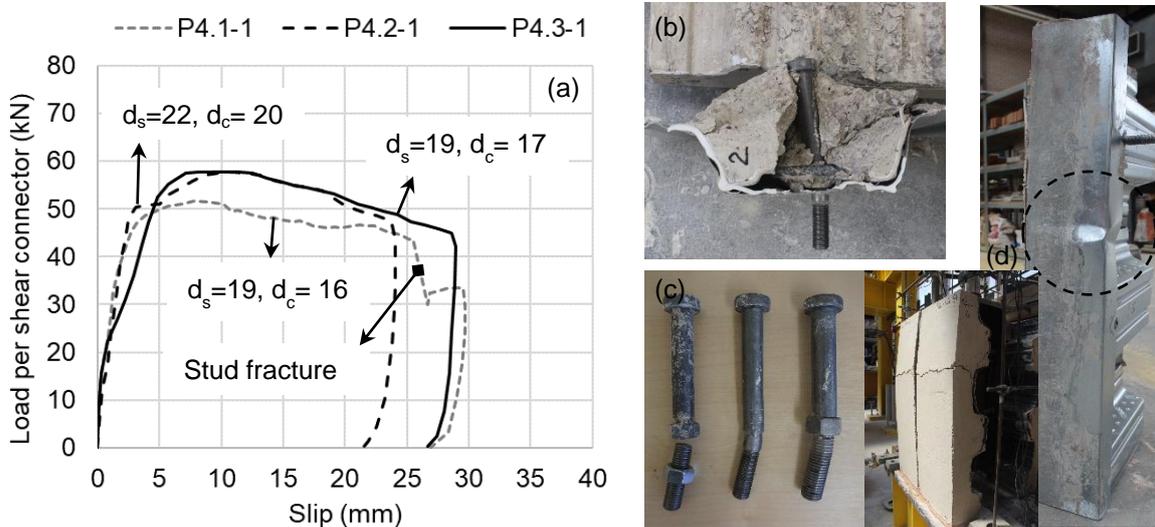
Results from P4.1-1, P4.2-1 and P4.3-1: (a) load vs. slip curves (b) concrete cone (c) shear connectors after test (d) local buckling of the edge trim and transverse concrete cracking in slabs
